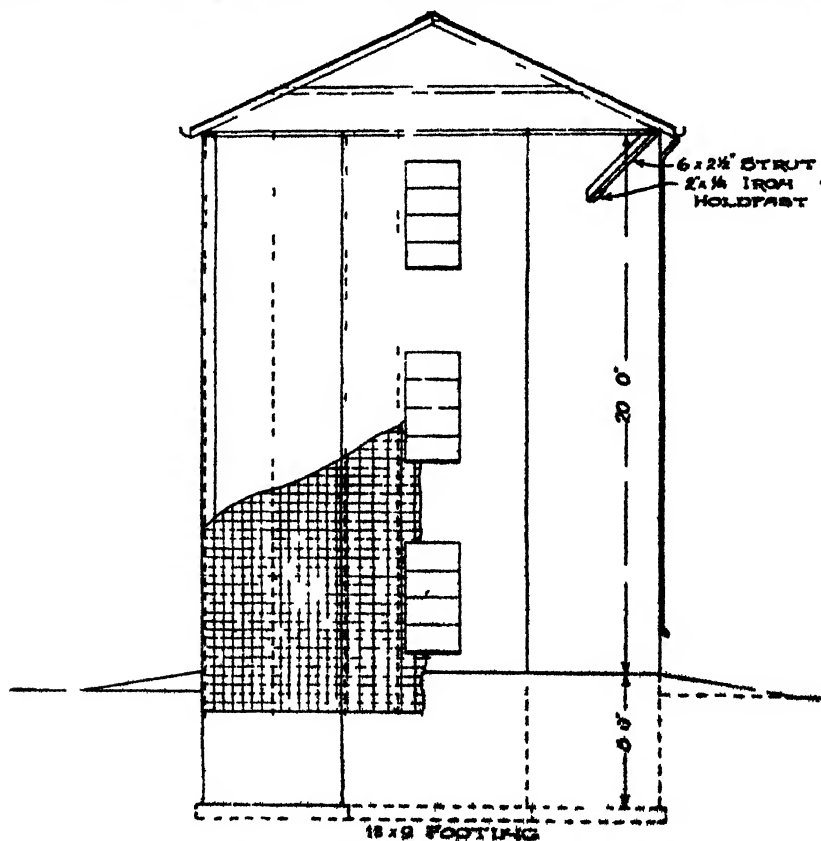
Section and Elevation of Octagonal Concrete Silo.
